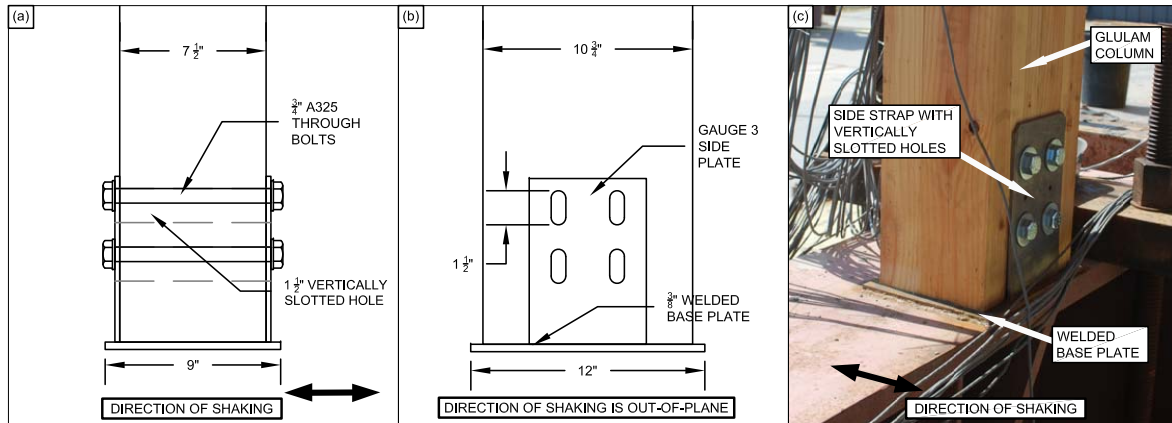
Gravity frame connection joint 1 (a) side view schematic (b) exterior view schematic (c) photo showing constructed connection
